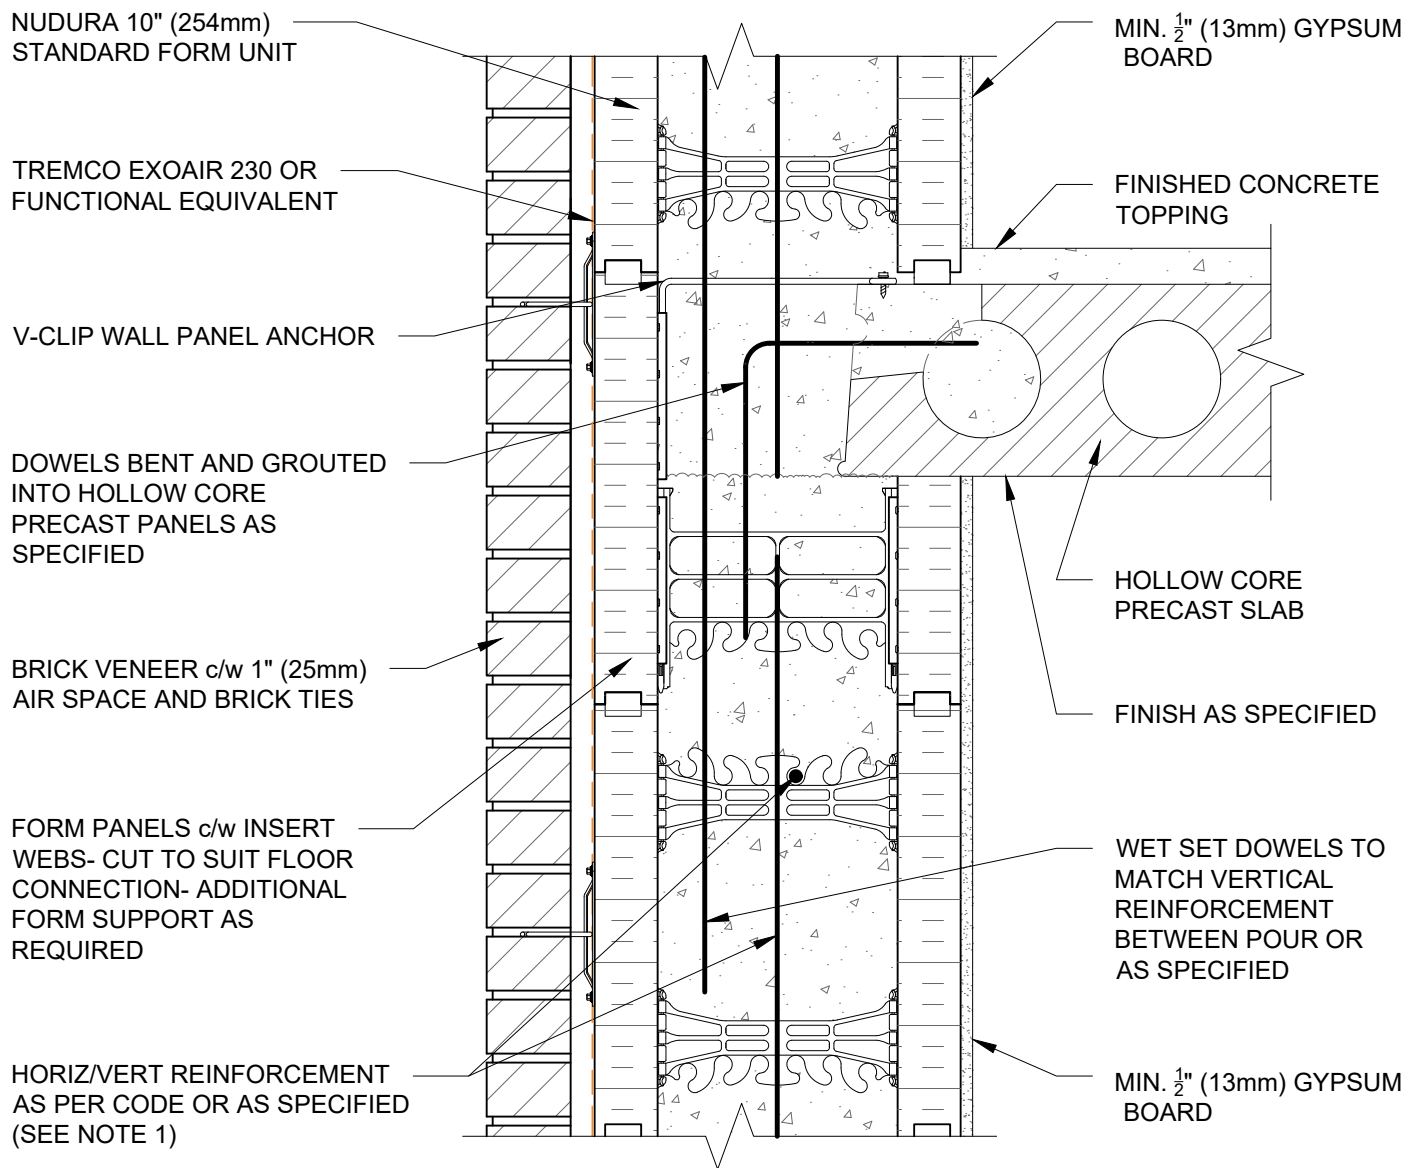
" (254mm) Form Unit, Hollow Core Precast Slab, Intermediate Floor Connection, Exterior Bearing Wall Detail, Brick Veneer Finish
